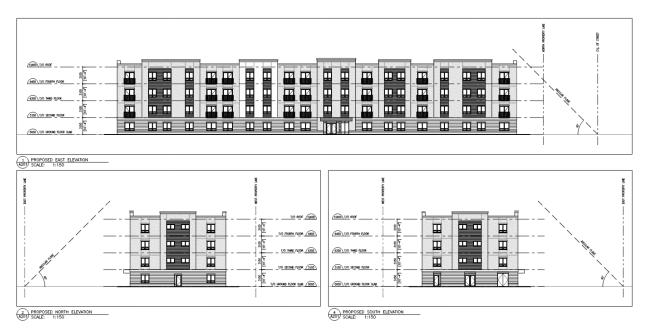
Conceptual building elevations and angular planes Source: Cusimano Architect
